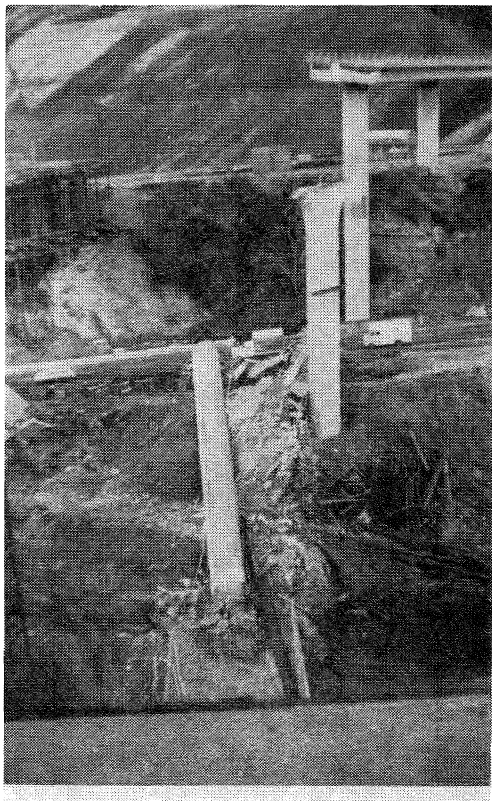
The collapsed pier and superstructure of the South Connector Overcrossing. This view was taken from the remaining eastern section of the bridge looking towards the western section. The pier standing between the two sections is for an overcrossing under construction.
